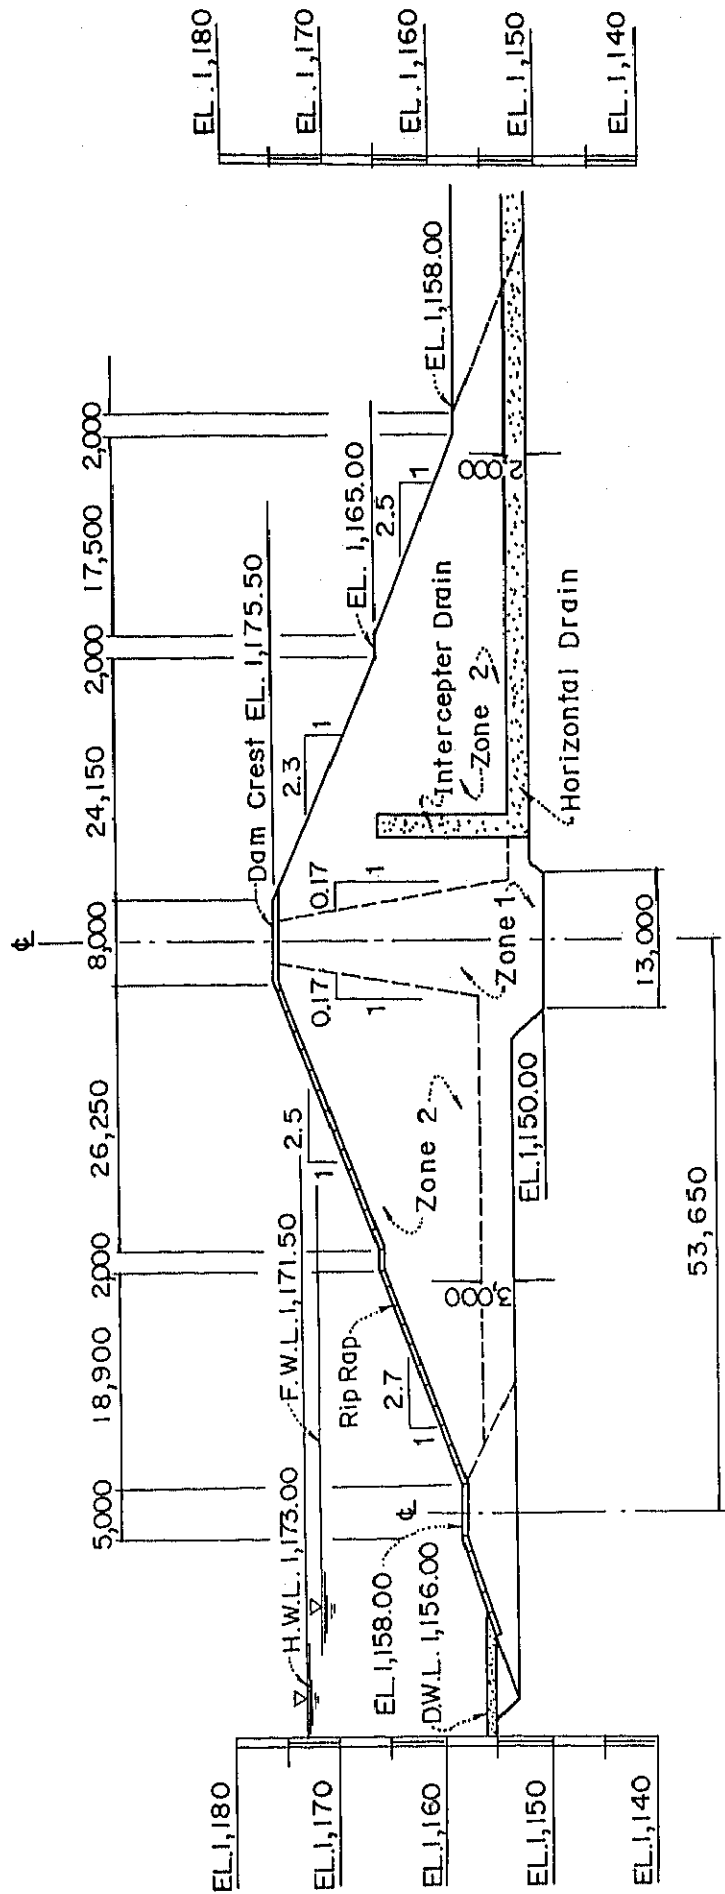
TYPICAL SECTION OF NJA DAM
